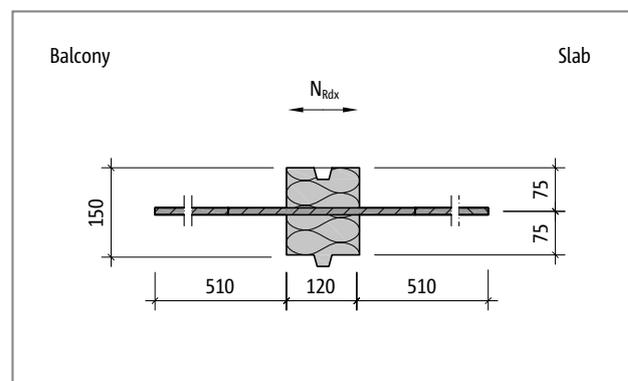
Schöck Isokorb® XT type H-NN2: Product plan view
